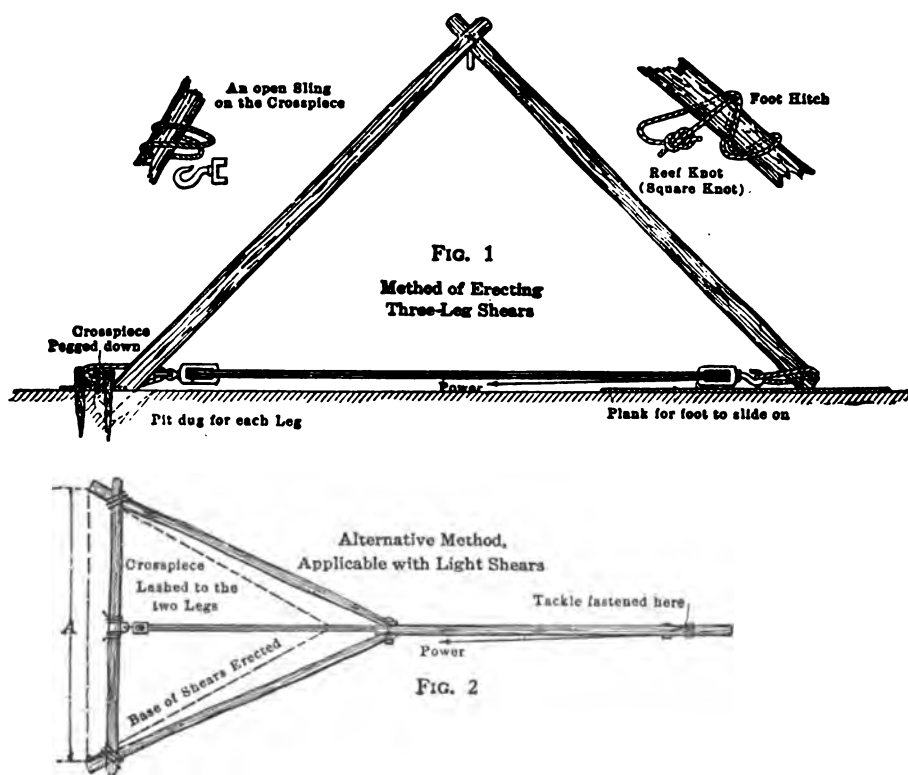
PLAN AND ELEVATION OF THREE-LEG SHEAVES.
